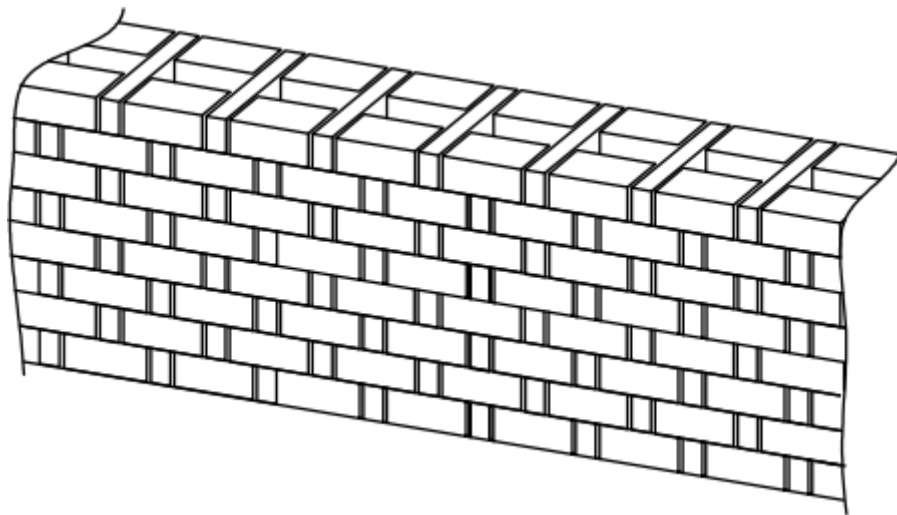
ISOMETRIC VIEW OF ROW LOCK BOND STRAIGHT WALL
